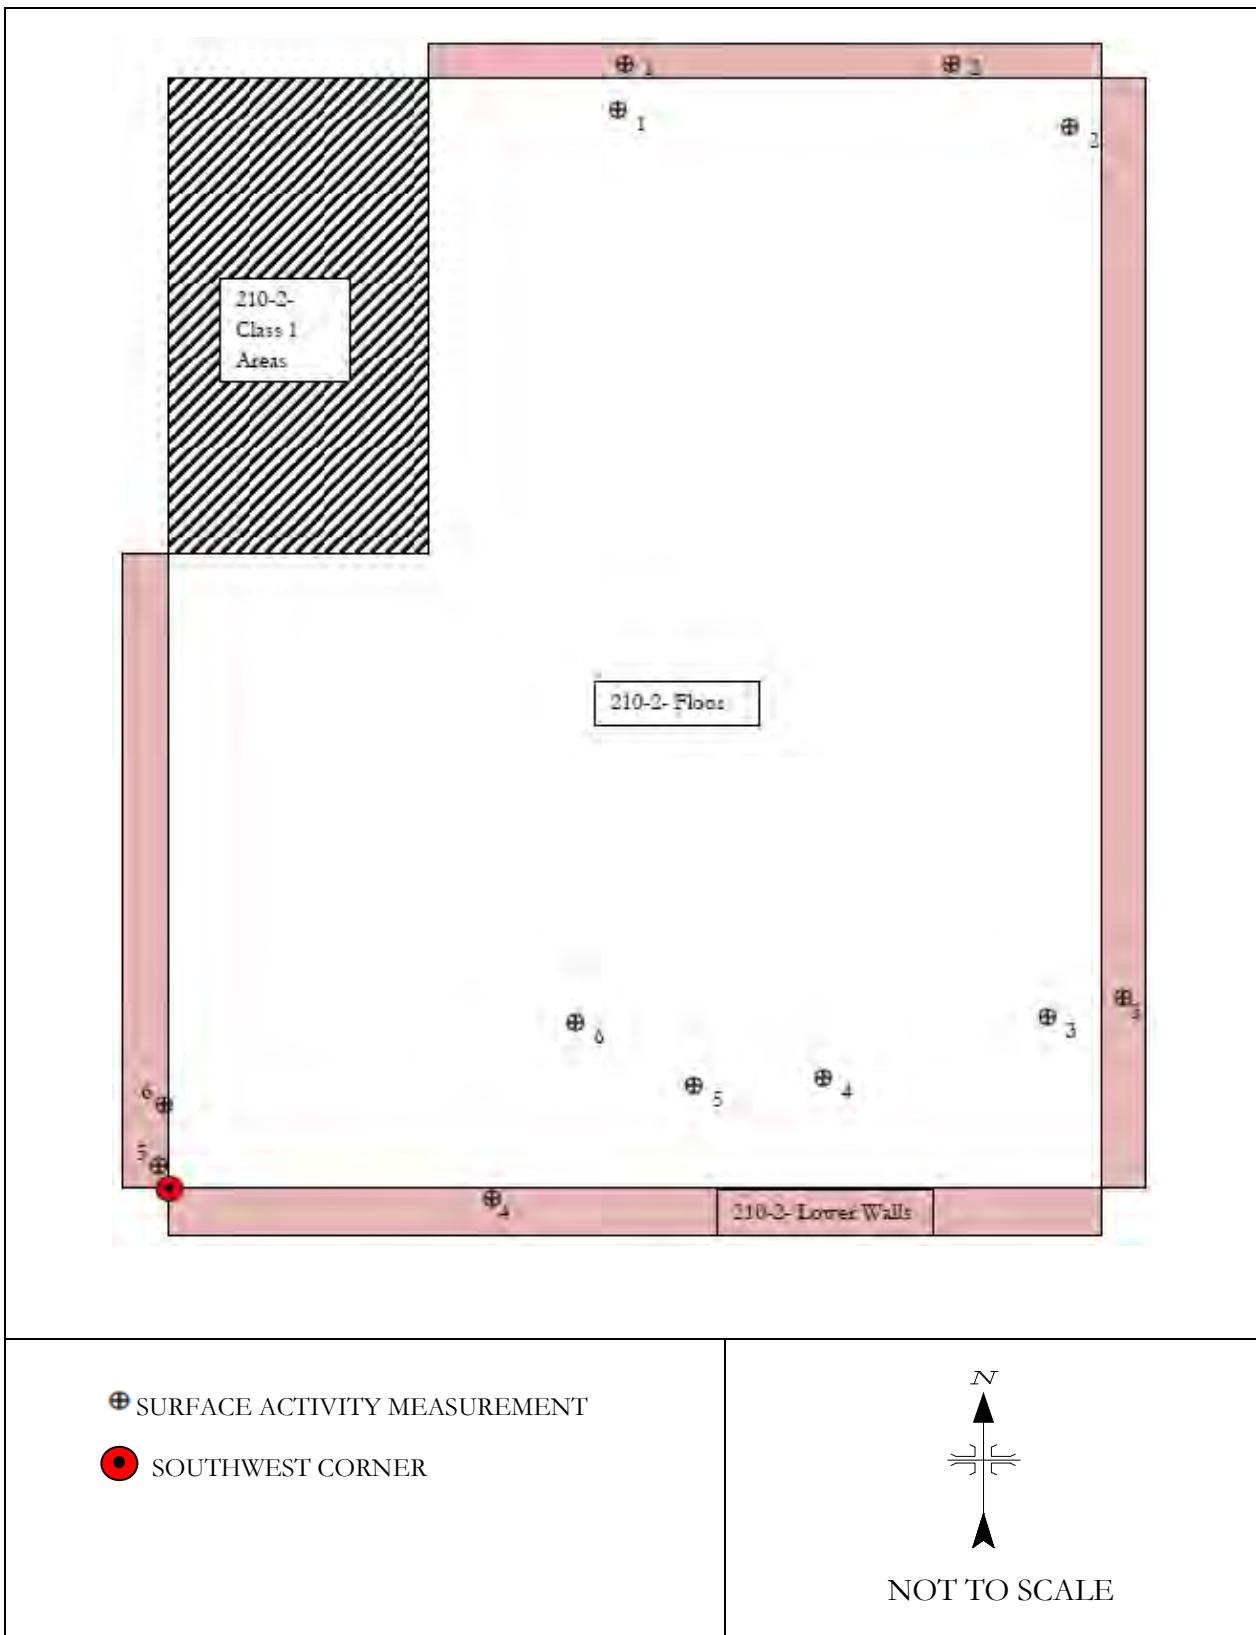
Building 210 Section 2 Floor and Walls—Direct Measurement Locations
